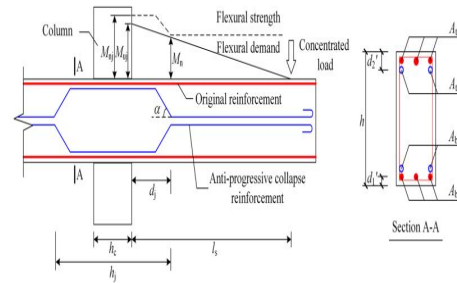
Design requirements for the detailing [Color figure can be viewed at www.wileyonlinelibrary.com]
